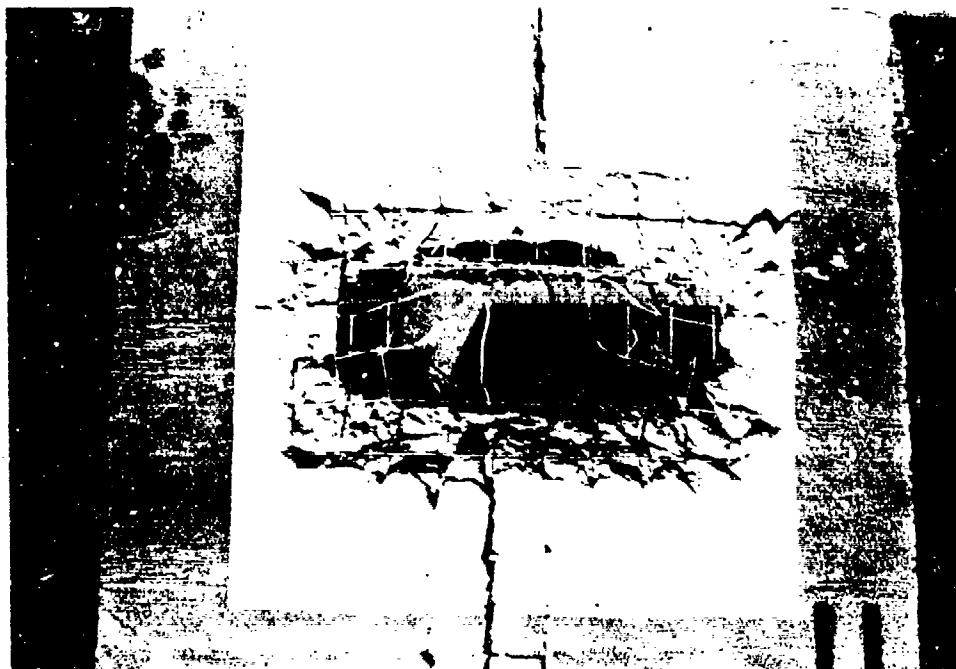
Test 11 Wall Damage (Type A, 2.4-Pound Cased Charge).
